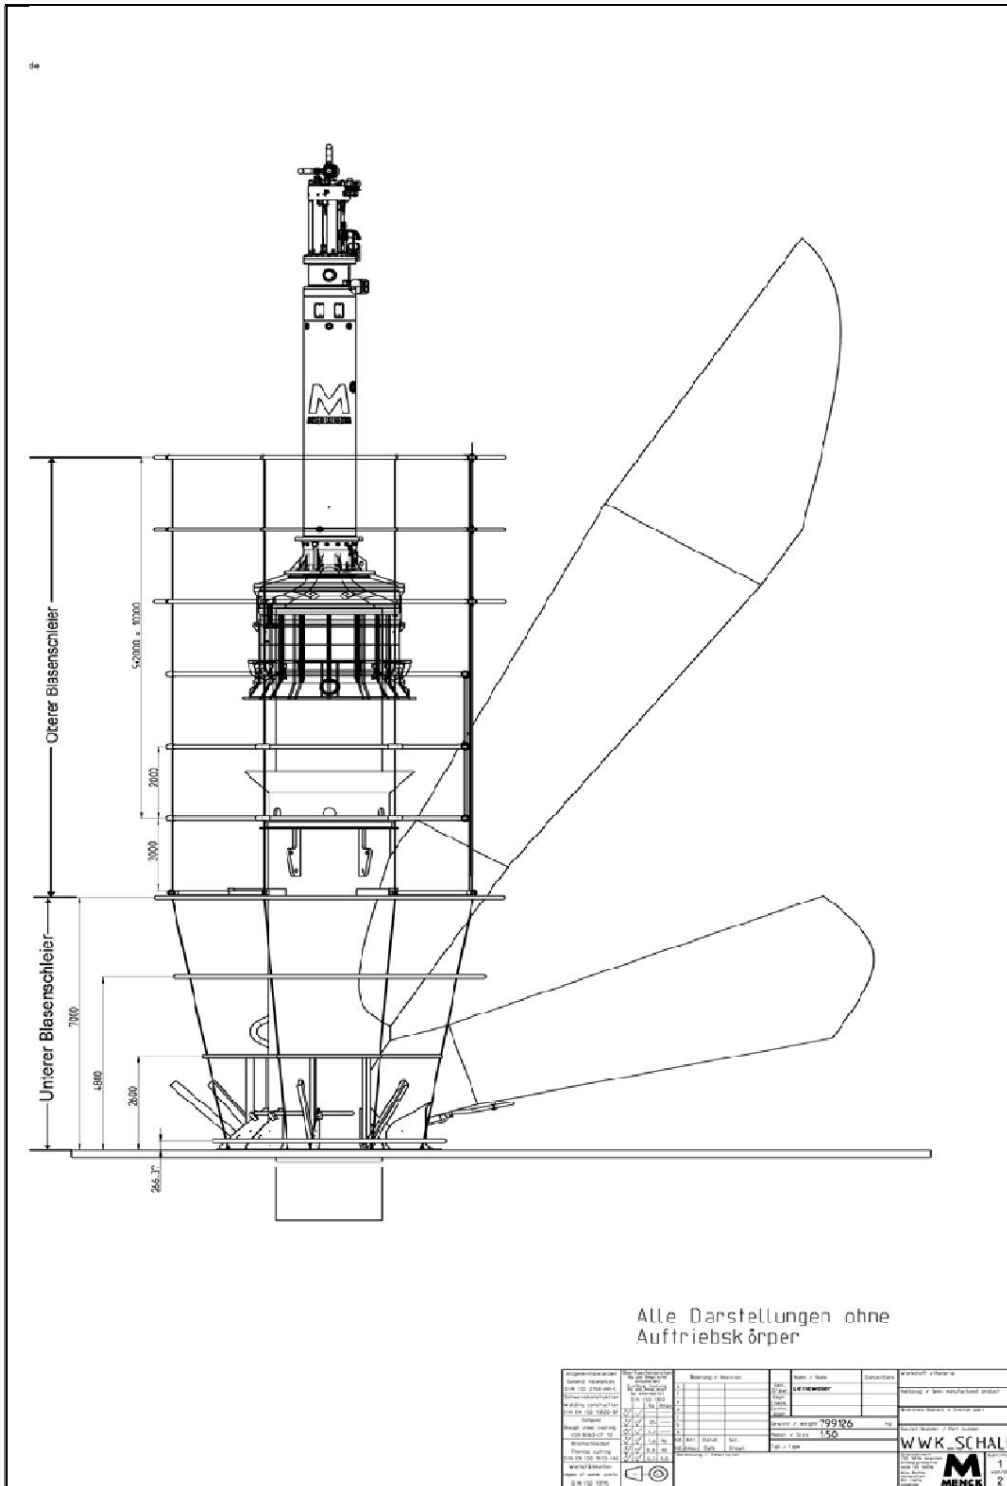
Technical drawing of the tiered "Little Bubble Curtain" (lower tripod foundation structure) of the tiered "Little Bubble Curtain" (upper tripod foundation structure)
